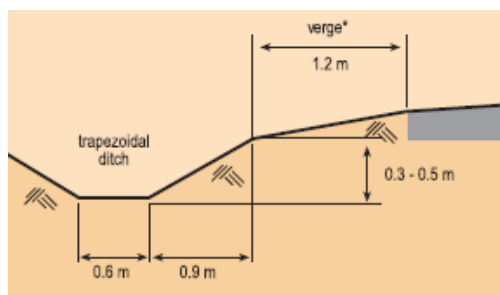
Typical Trapezoidal Drain (ARRB 2009)
